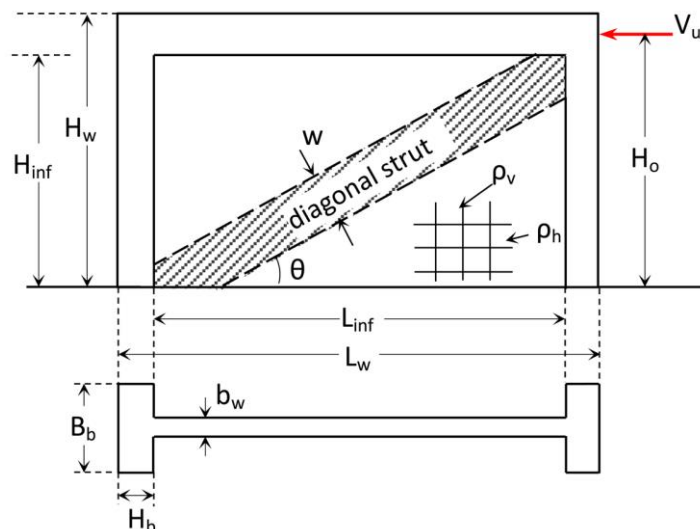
Symbols used for the characteristics of reinforced concrete walls
